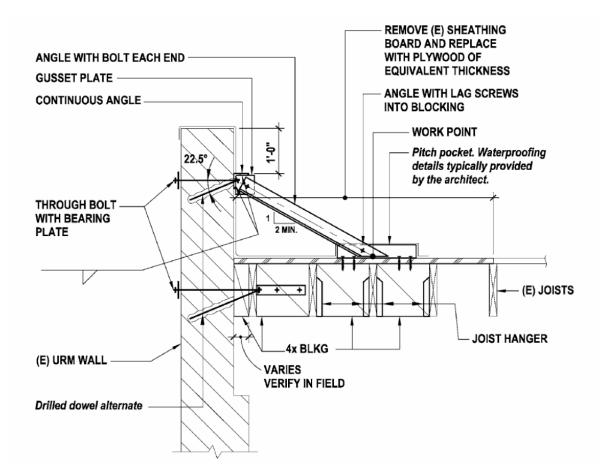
Parapet restraint detail (FEMA 547, 2006)
